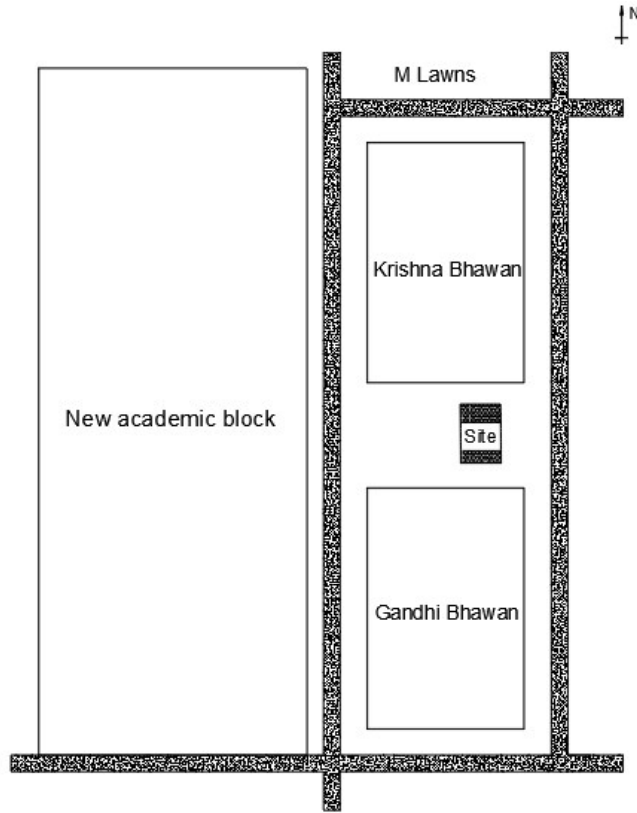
Location of concrete bridge deck slab at BITS Pilani – Pilani campus
